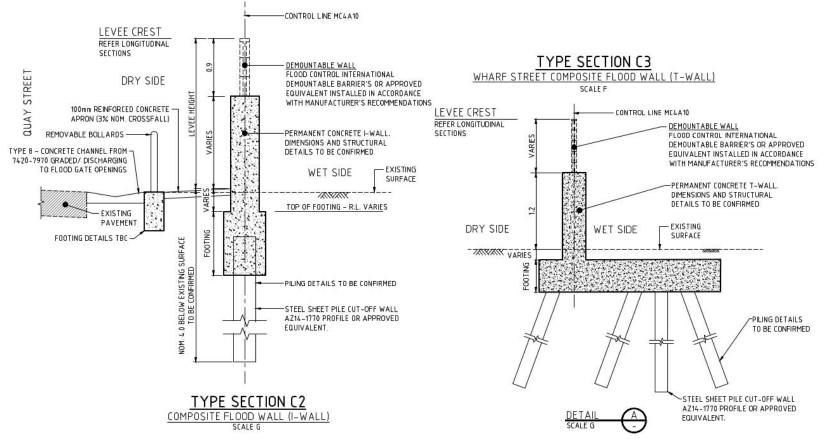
Typical Sections – SRFL Demountable Wall and Composite Wall
